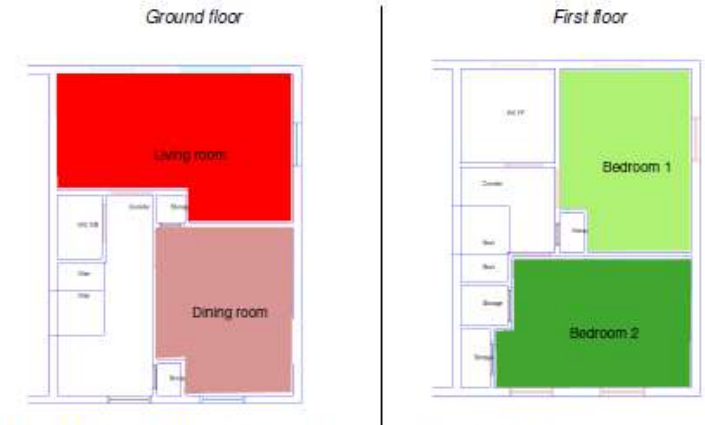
Floor plans of house 357 (Type 3). Rooms analysed are highlighted
